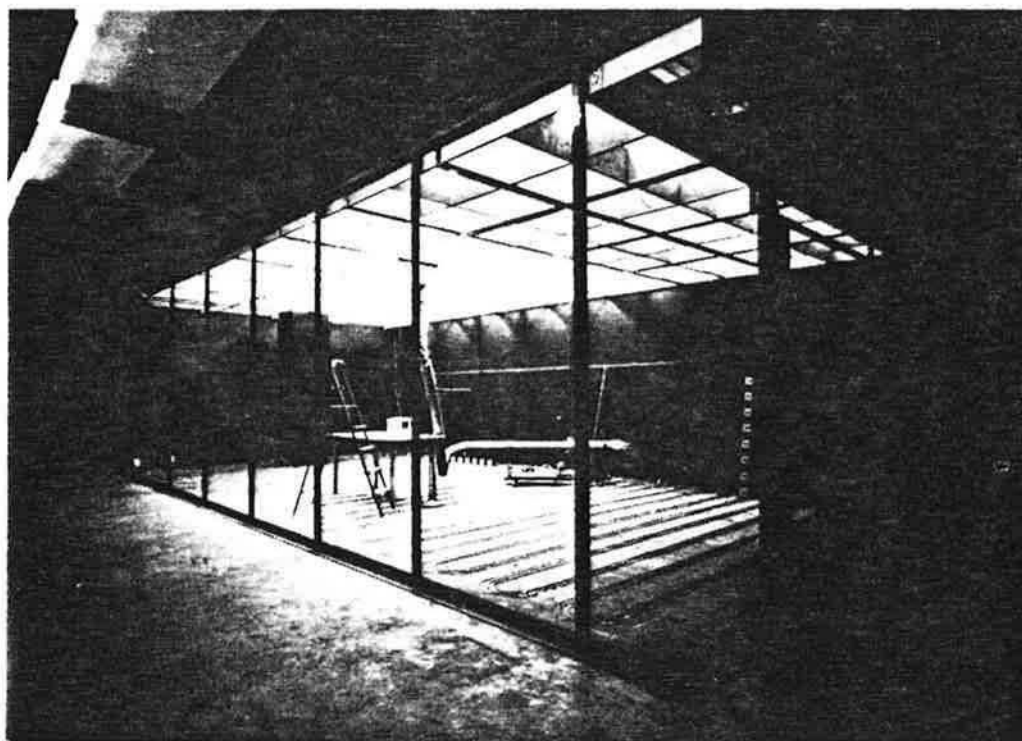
View of a test room: Induction units in the perimeter area, slit diffusers in the internal area, return air through the lamps. Internal load is established by electric heating of the floor.
